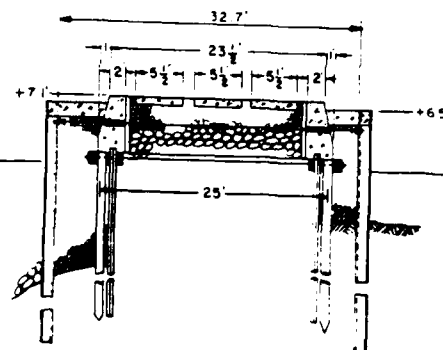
Typical north pier cross sections, South Haven Harbor, Michigan
